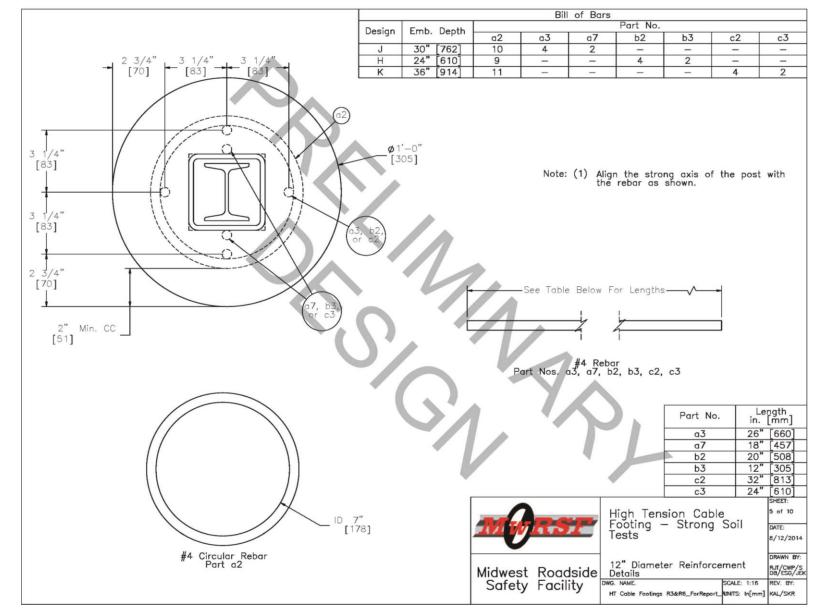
Reinforcement Details for 12-in. (305-mm) Diameter Foundations, Test Nos. HTCB-10 and HTCB-11
